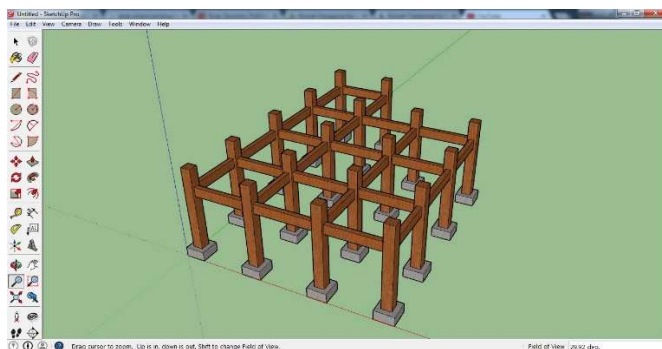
Foundation and Frame Construction of a House Embracing the Philosophy of Sulapa Appa
